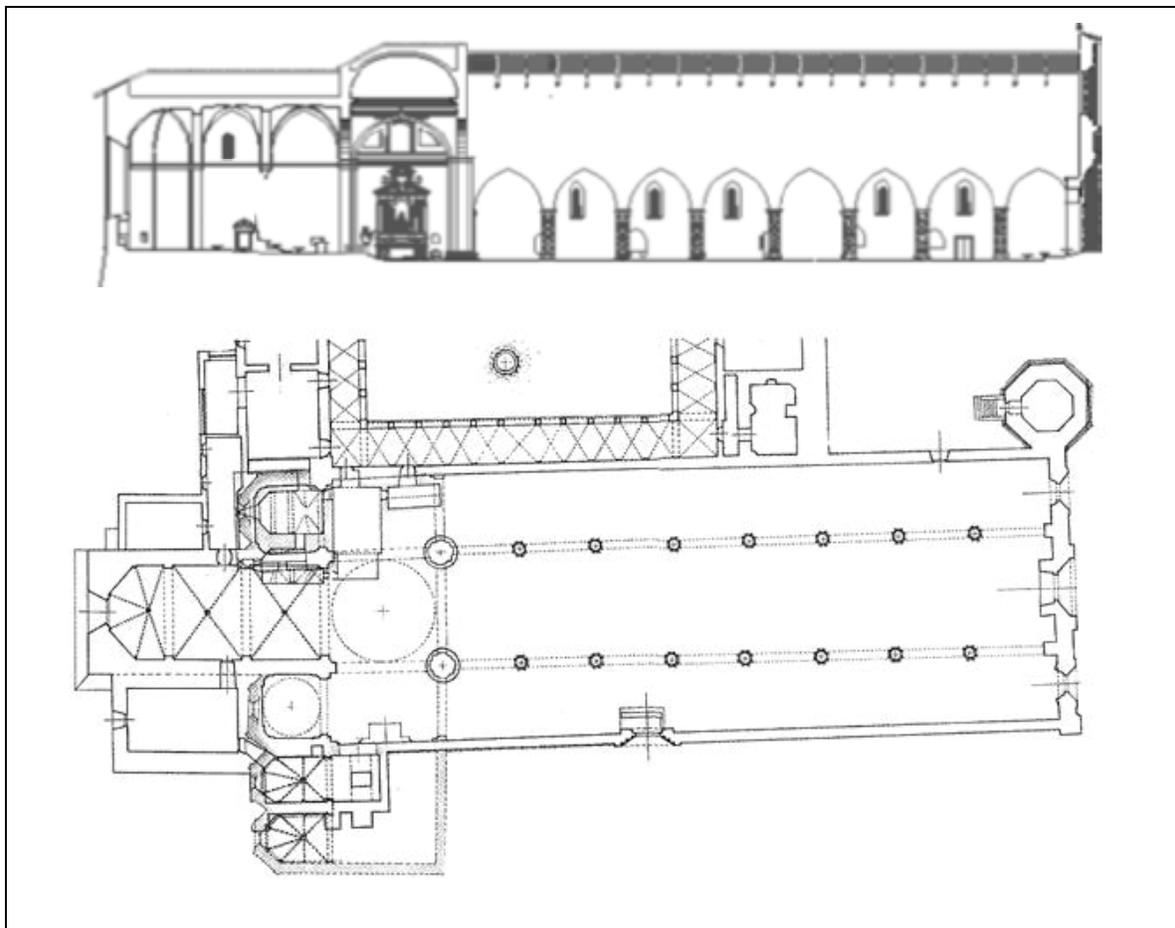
Plan and longitudinal view of Santa Maria di Collemaggio
